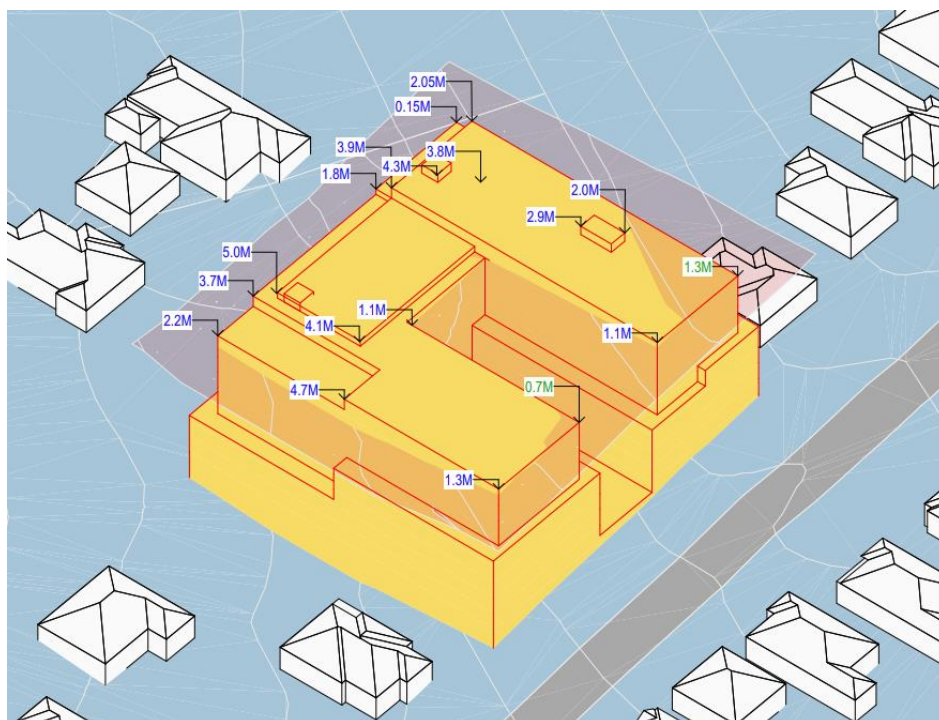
Extract of proposed plans showing Height Limit Envelop.
